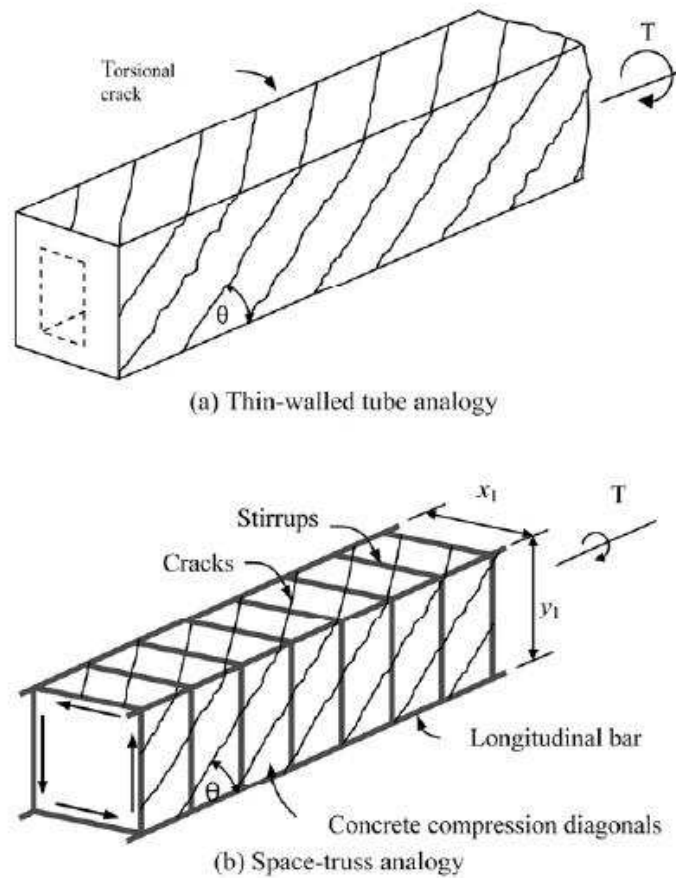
Thin-walled tube and space-truss analogy (Tang, 2006)
